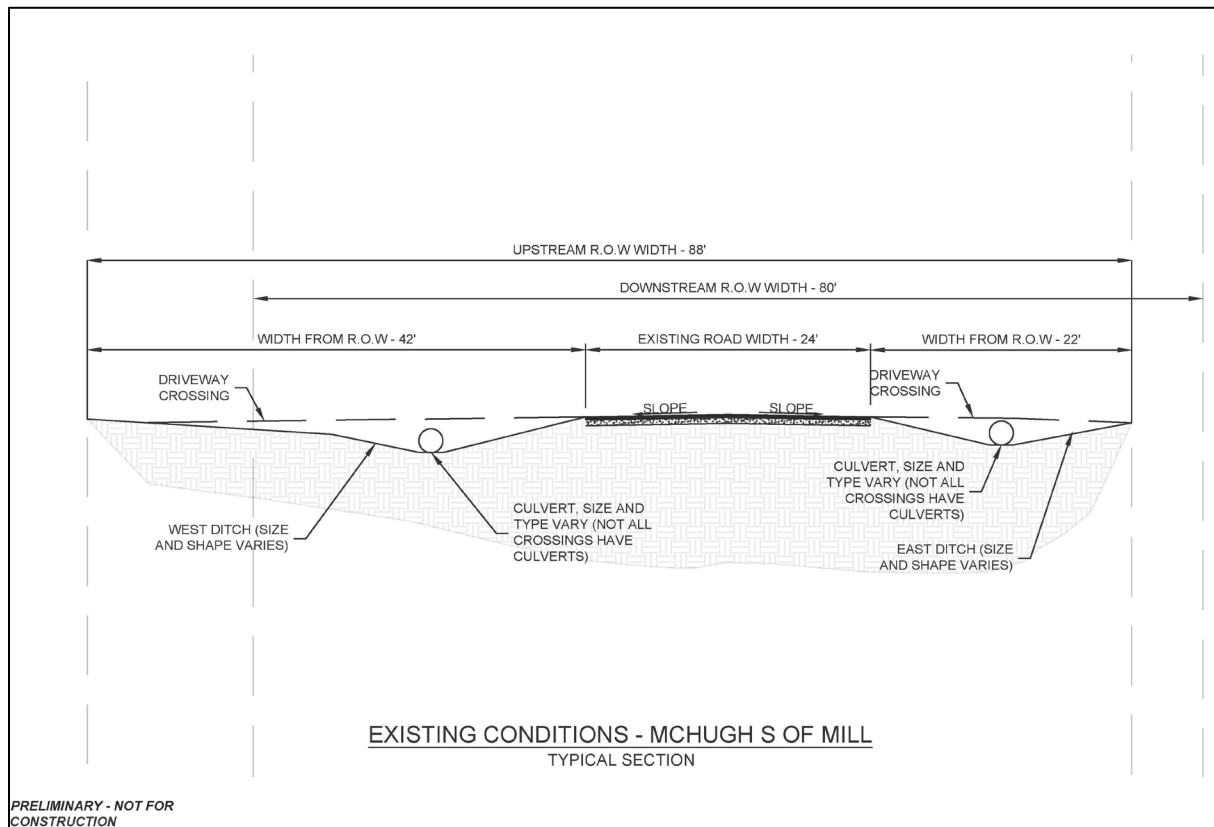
Typical section depicting existing conditions on McHugh Lane south of Mill Road.
